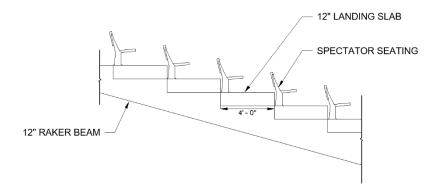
Typical Section Cut of Landing Slab and Raker Beam Interface
